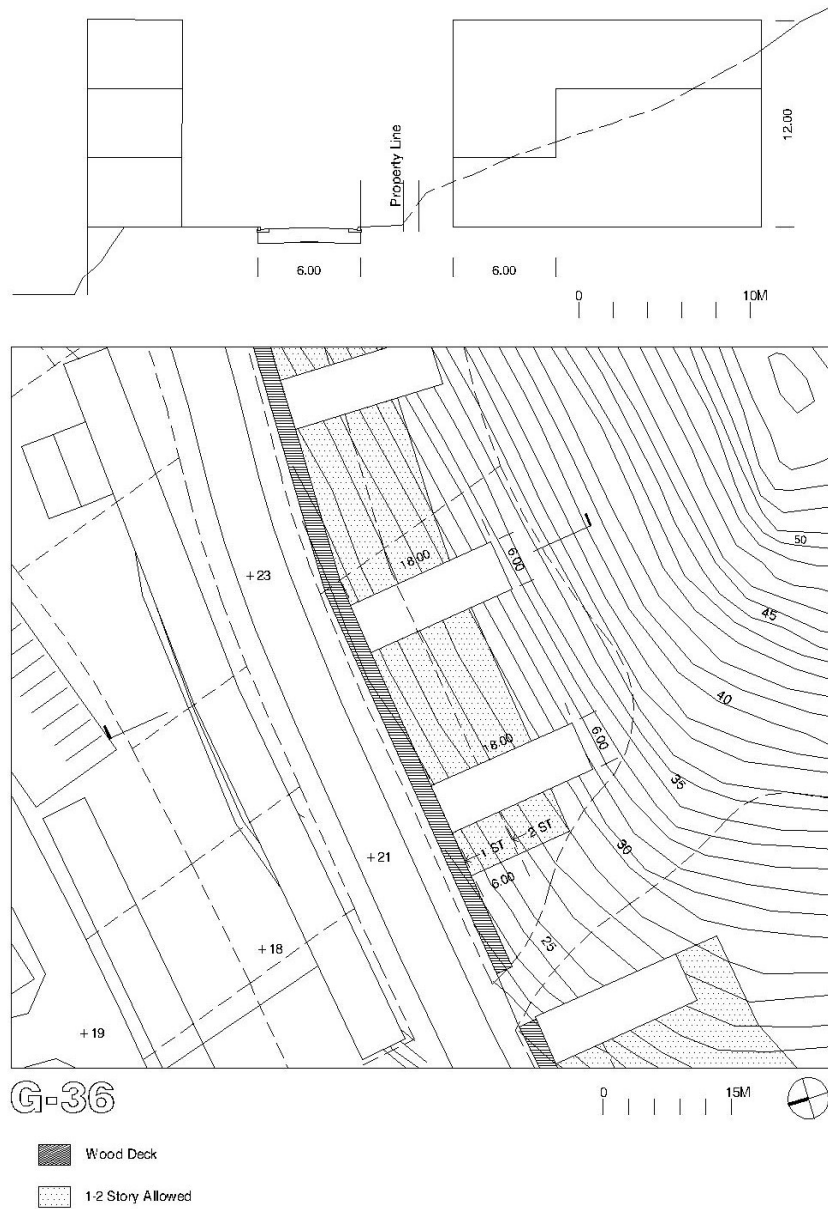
Site G-36. This site allows two 3-story 'podium' type buildings on a 1-2 story platform.
